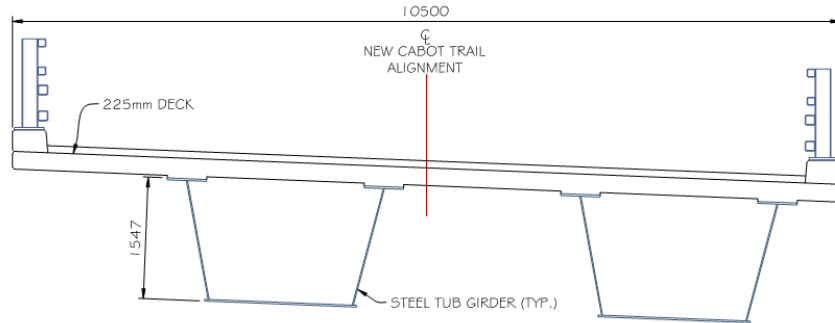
Cross-section of MacKenzie River Bridge: As-Tendered design using Steel Box Girders
